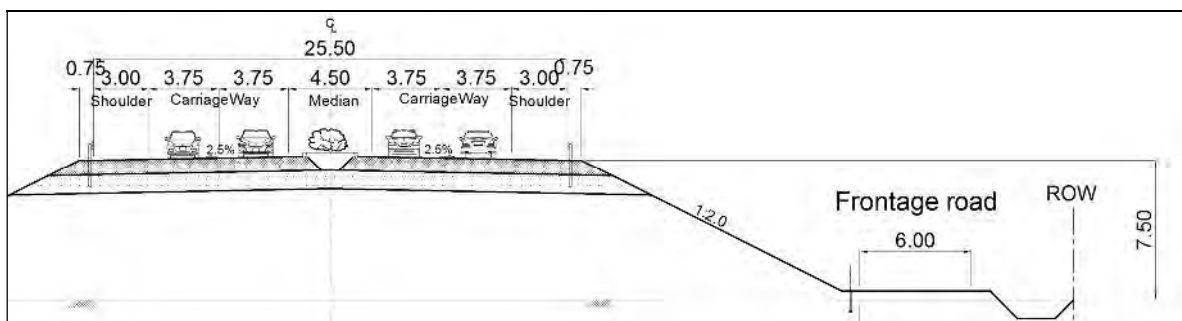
Typical Cross Section of High Embankment Section with Frontage Road
